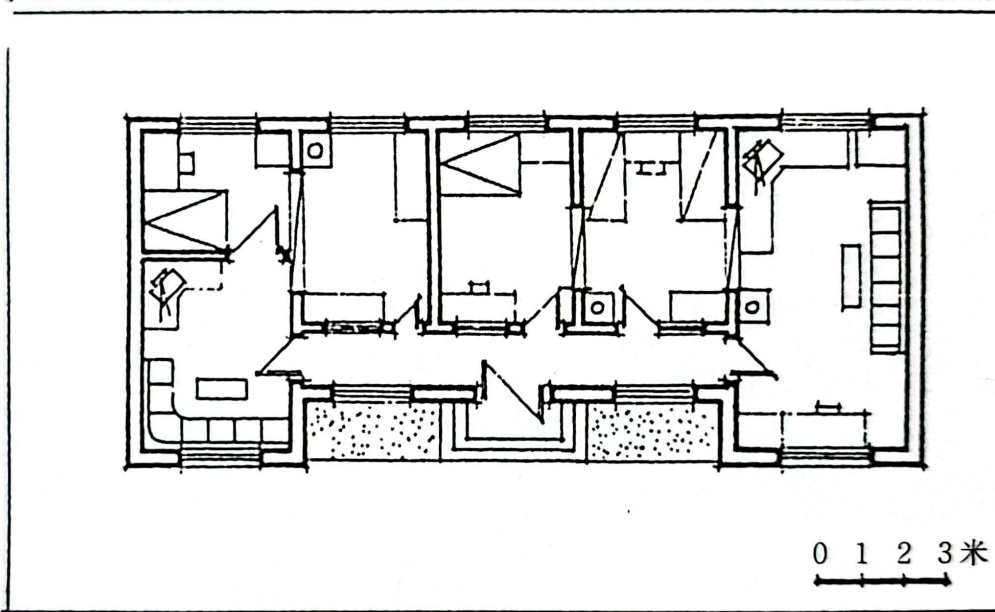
Floor plan of the same residence.⁷⁶
